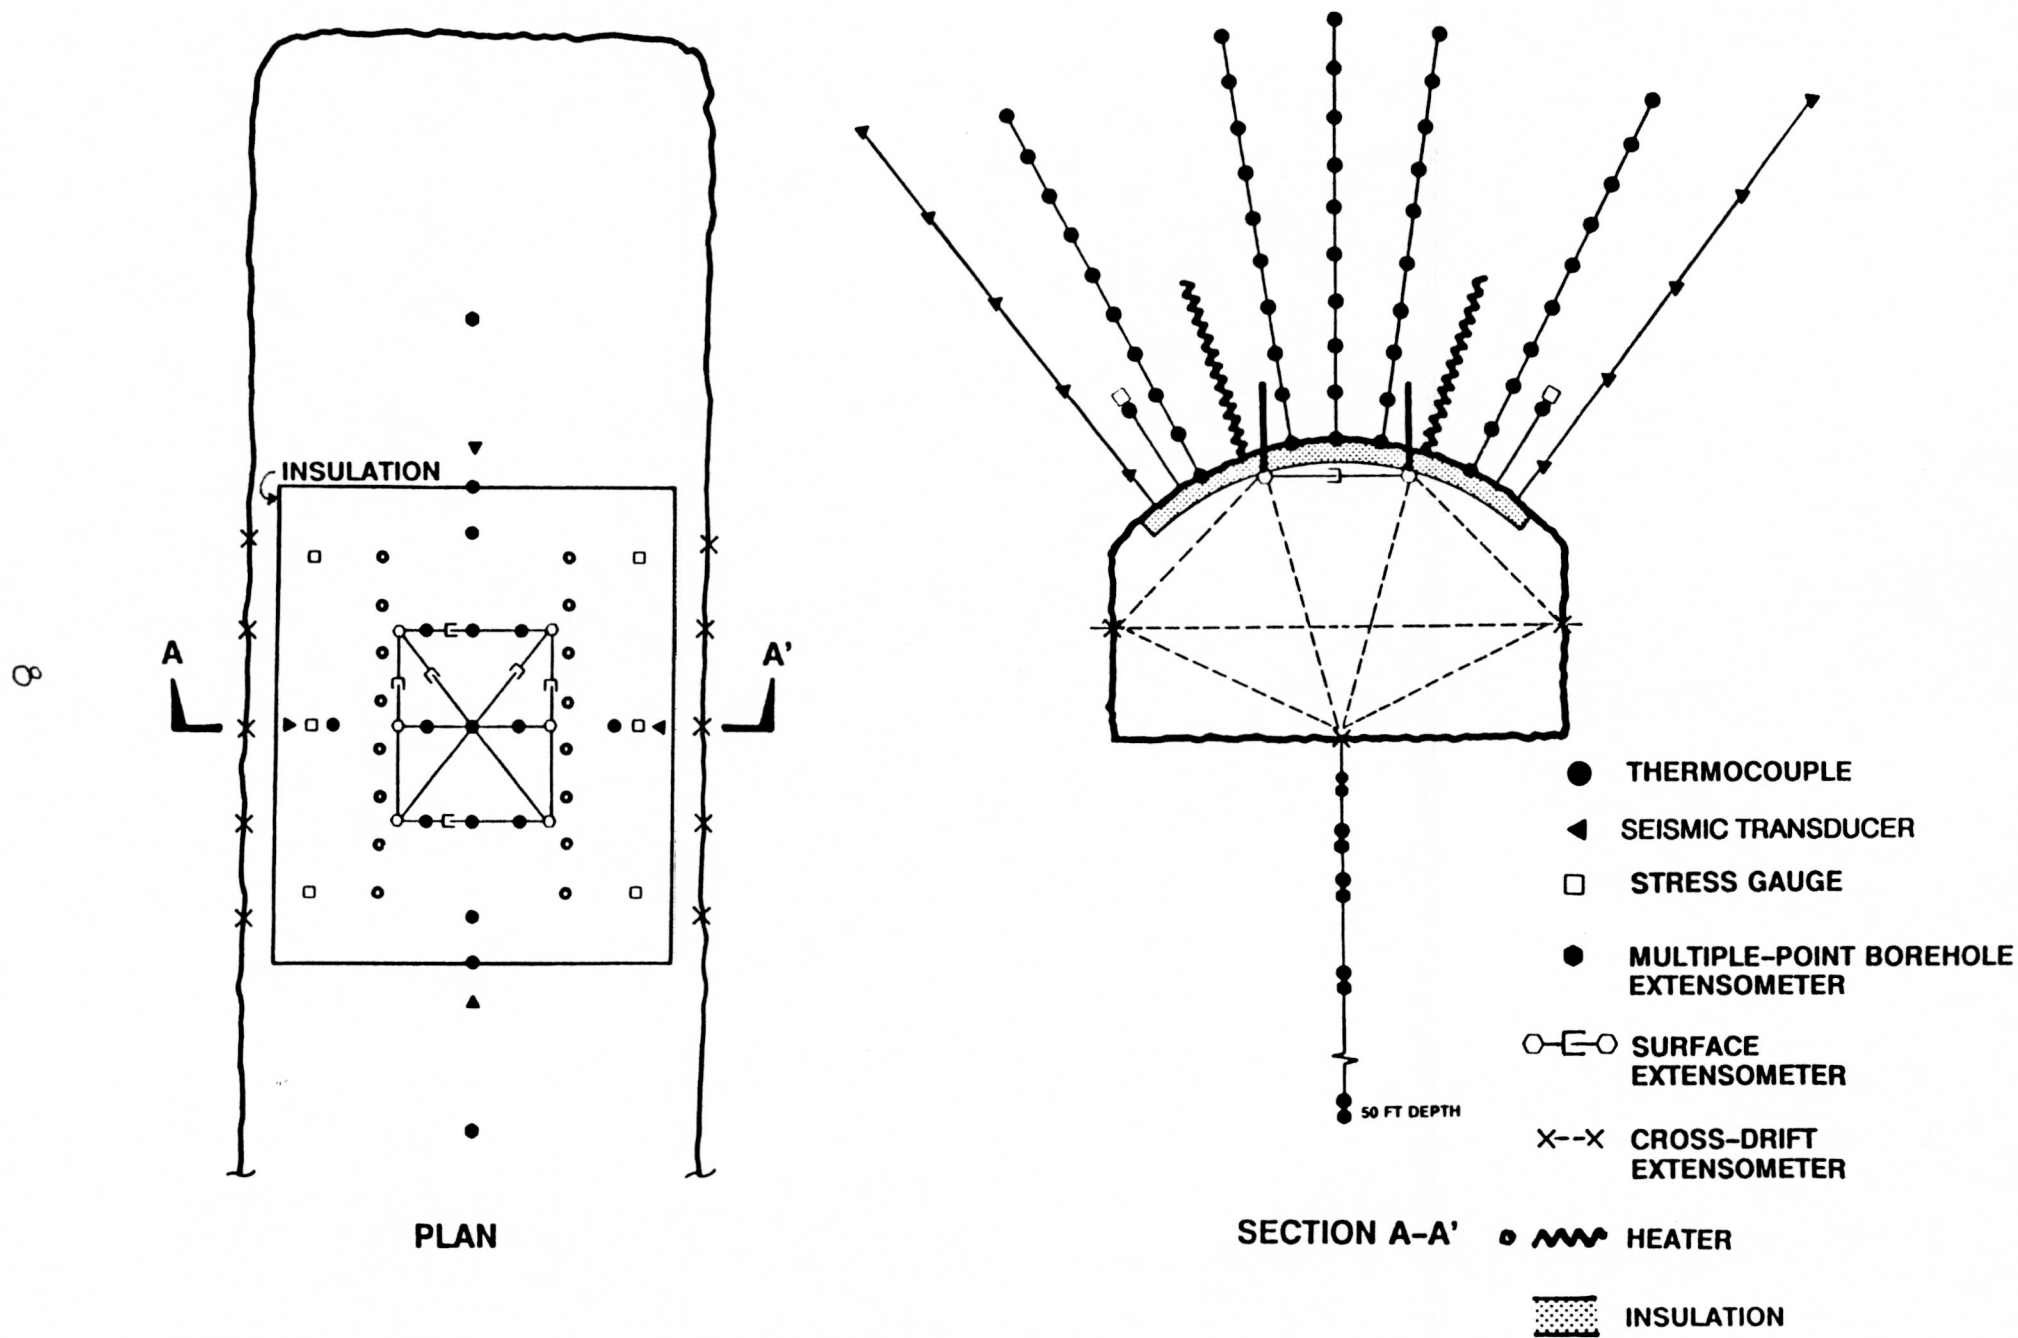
CONCEPTUAL LAYOUT OF THERMAL-STRESS TEST
